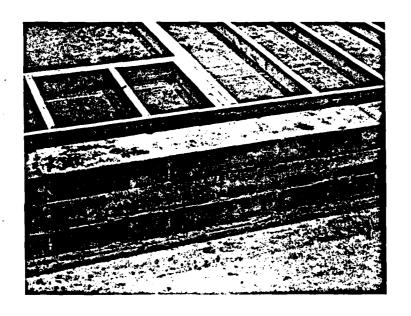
Wall Framing on Laboratory Floor Showing One Foot Concrete Block Sill in Test Opening.
